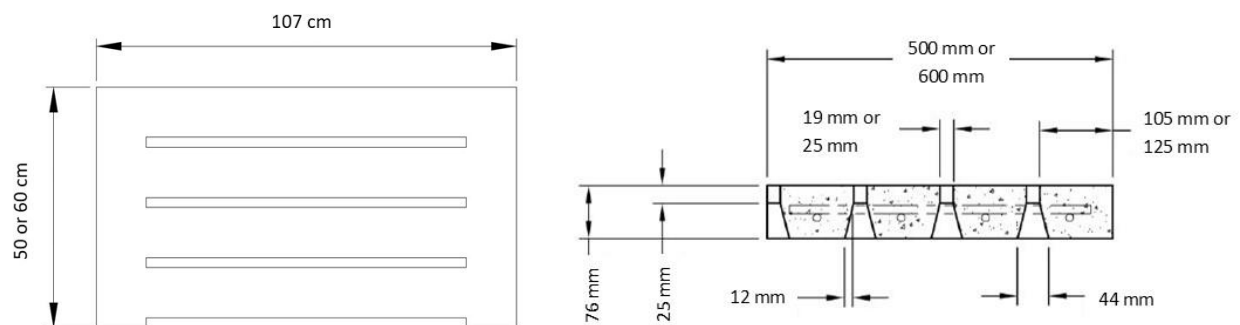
Detailed drawing of concrete panels of the slatted concrete floors in gestation rooms (plan view and side view)
